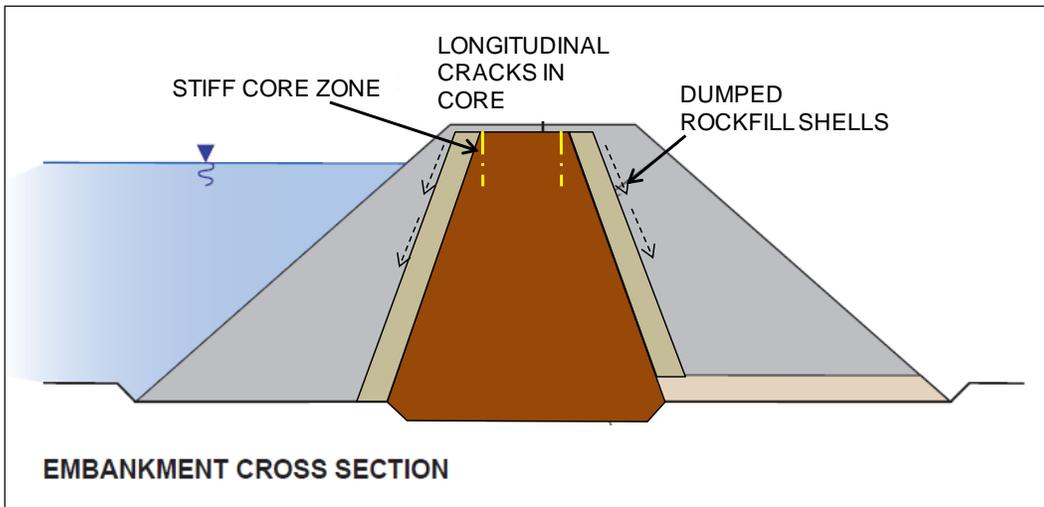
B-7. Cracking and Hydraulic Fracture due to Arching of Core onto Embankment Shells (Courtesy of Mark Foster)
